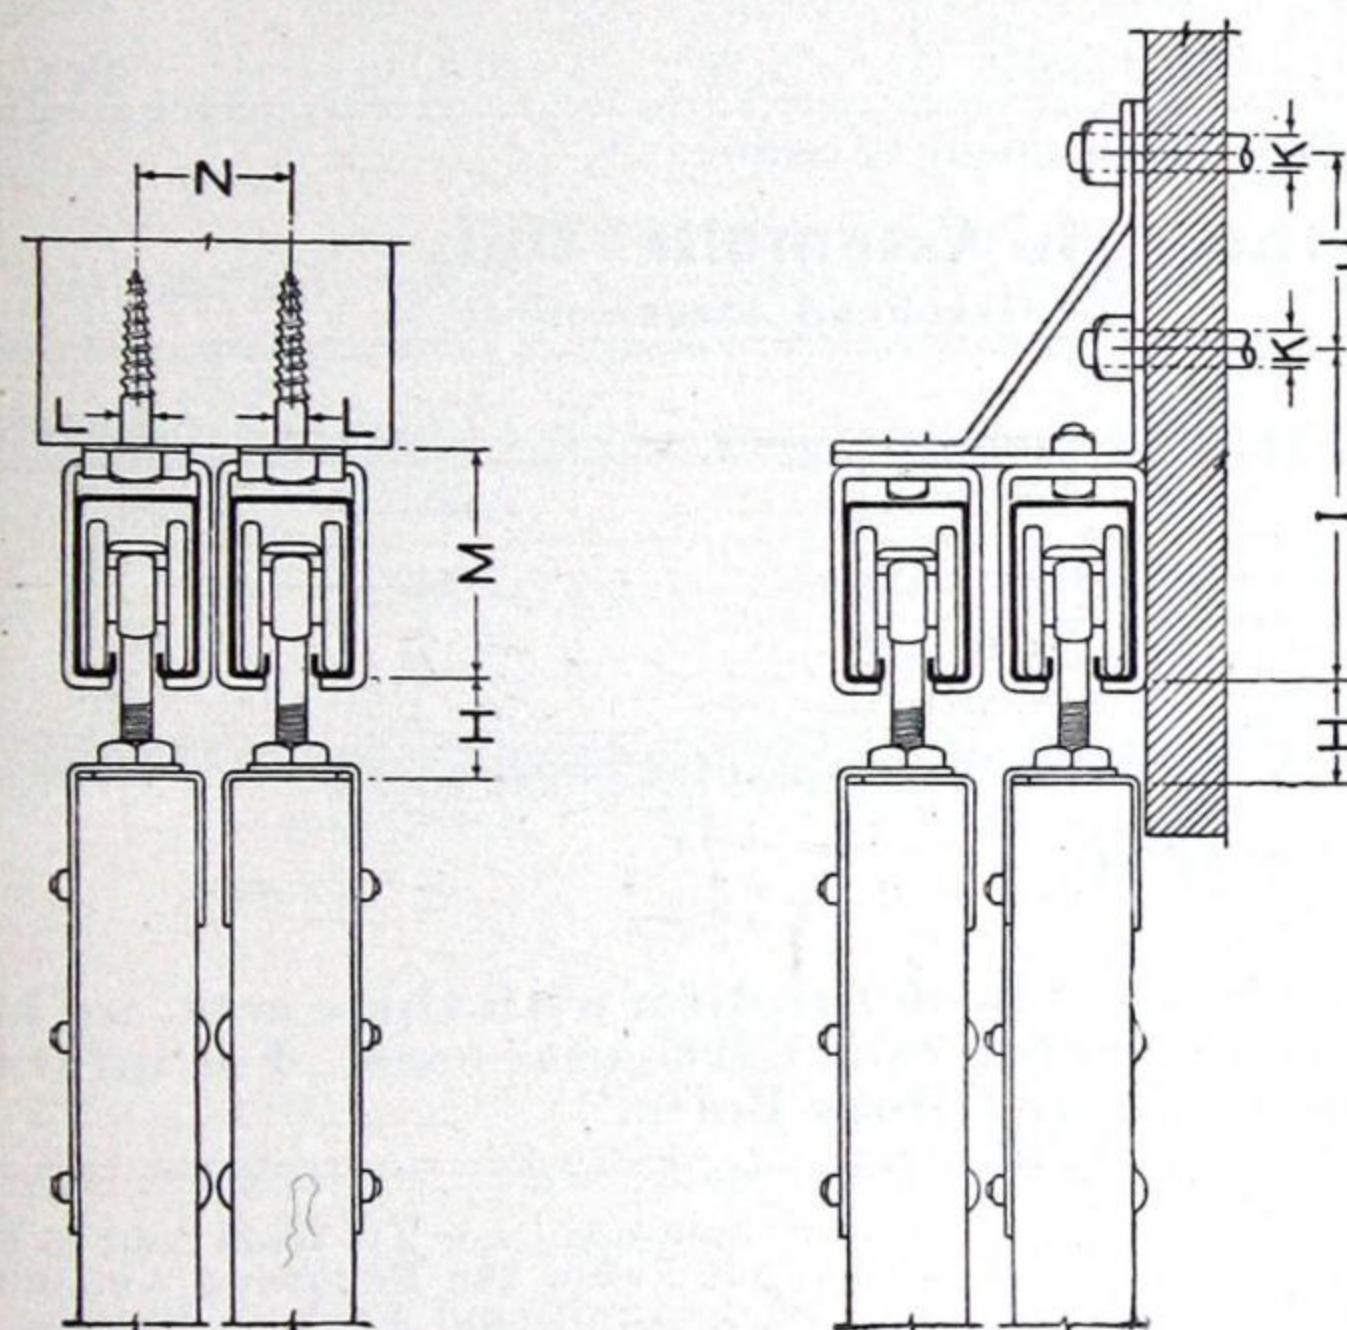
Cross-section showing overhead bracket attachment without weatherstrip, of two parallel sliding doors. See page 96 for dimensions, using those referring to Fig. No. A-908.
